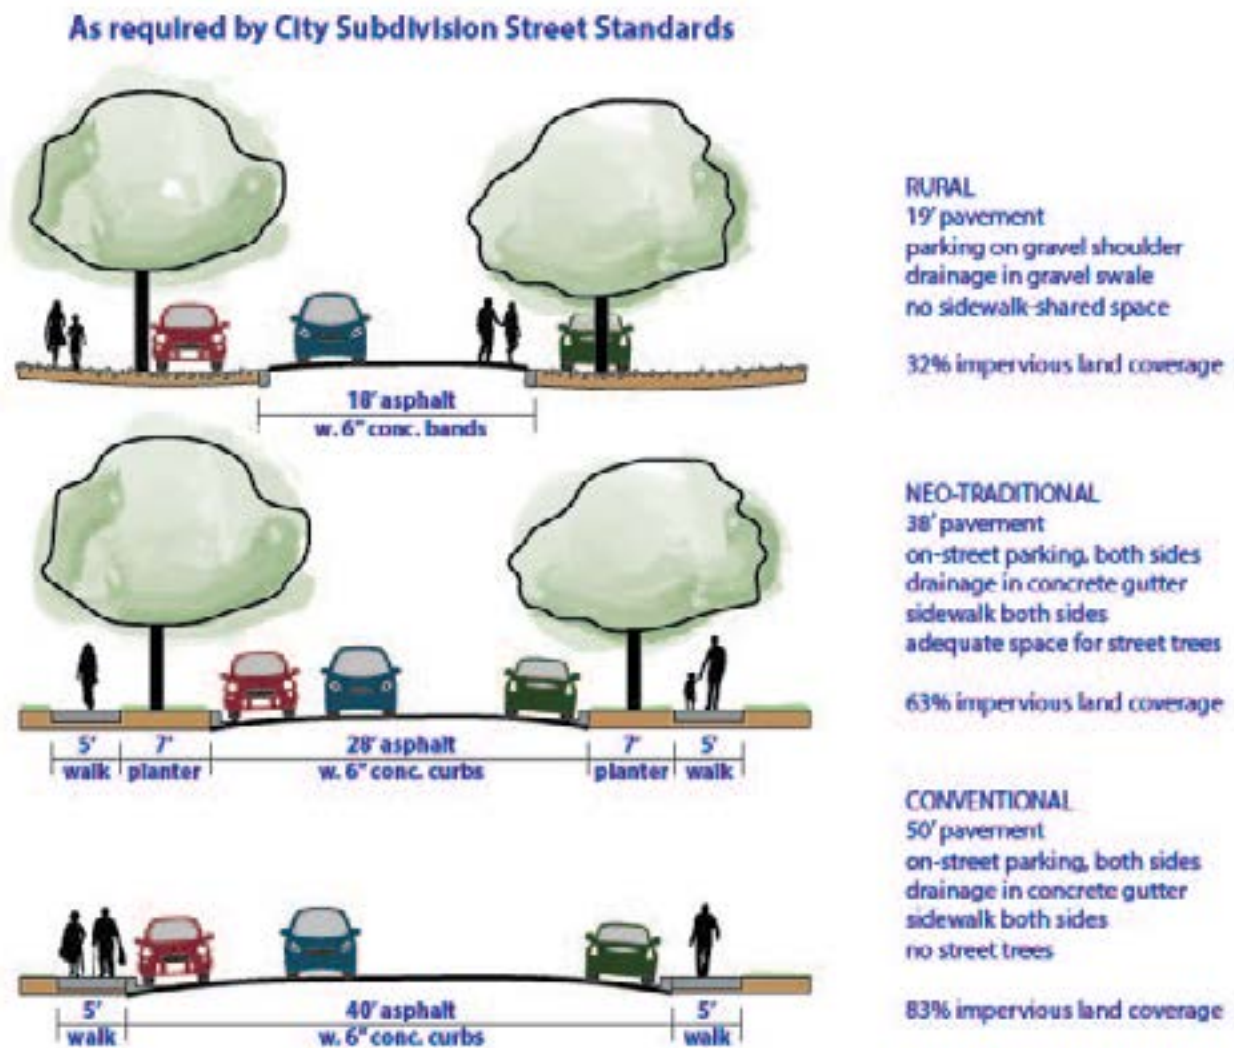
Comparison of Street Cross-Section (Two-Way, Residential Access Streets)
